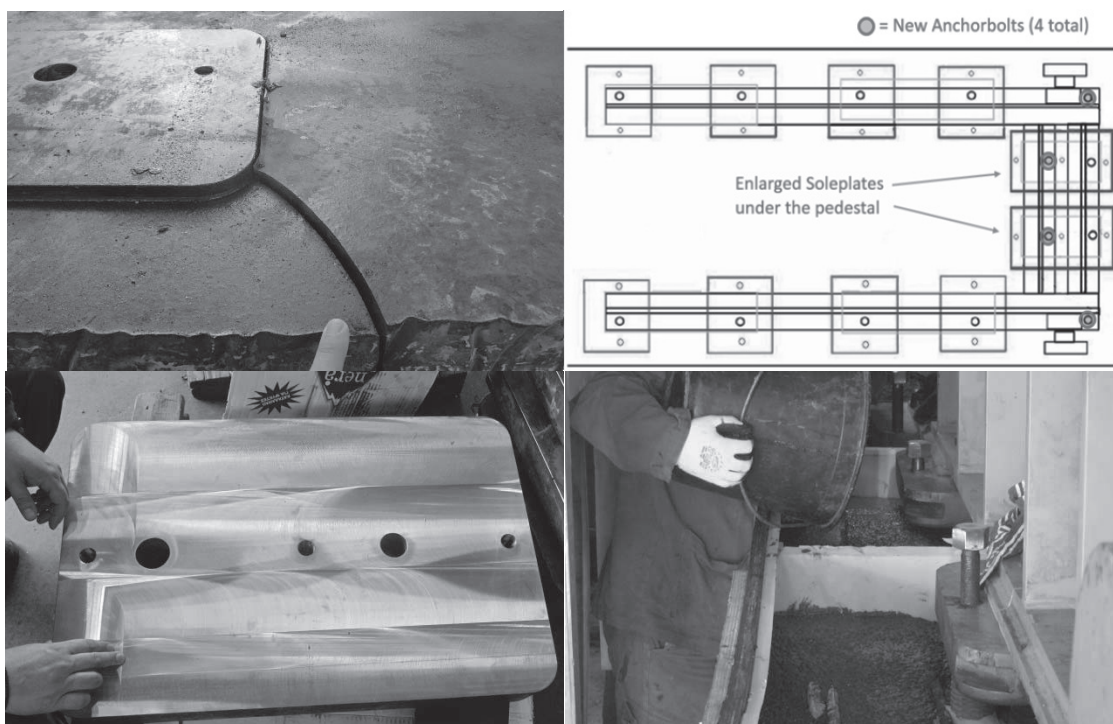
(Upper left) big cracks in the grouting, (upper right) schetch of new enlarged soleplates under the motor and new anchorbolts' positions, (down left) new enlarged soleplate, (down right) new grouting with expansion joints.
